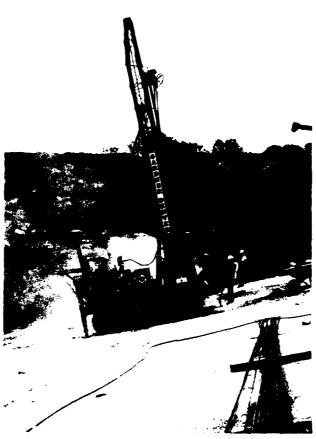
Anchor holes being drilled with track-mounted pneumatic drill
